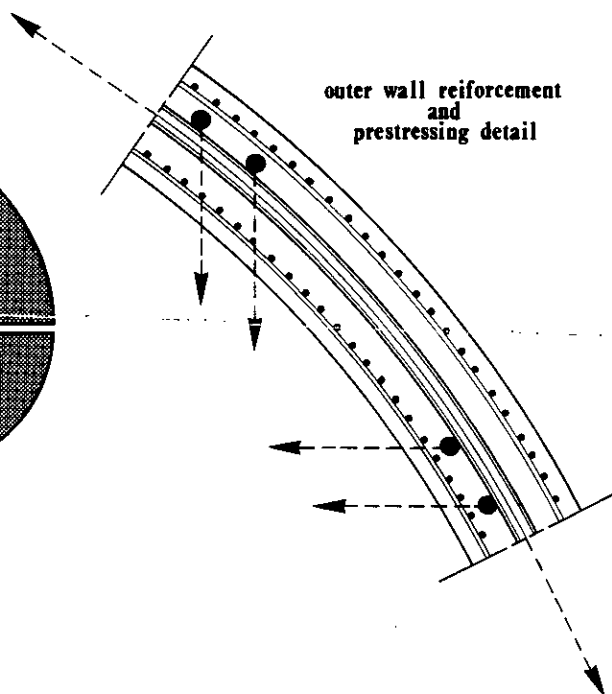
PRESTRESS DETAILING AND PROCEDURE OF OUTER SHELL WALL
